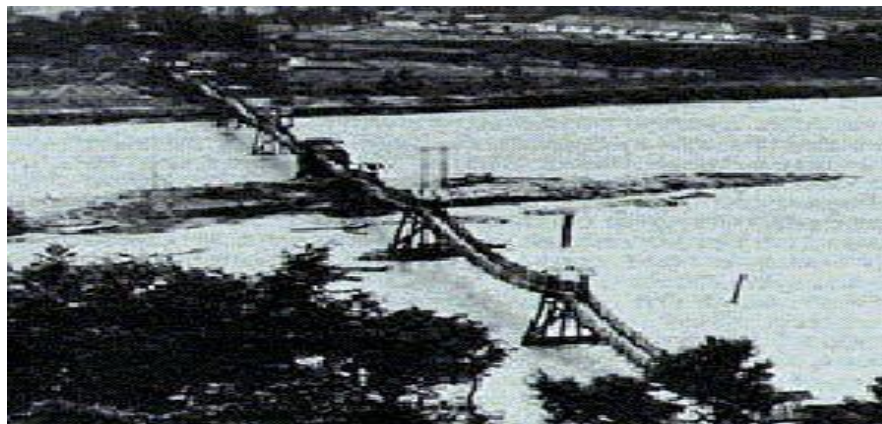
An-Lan Bridge in Kuanshein, China
